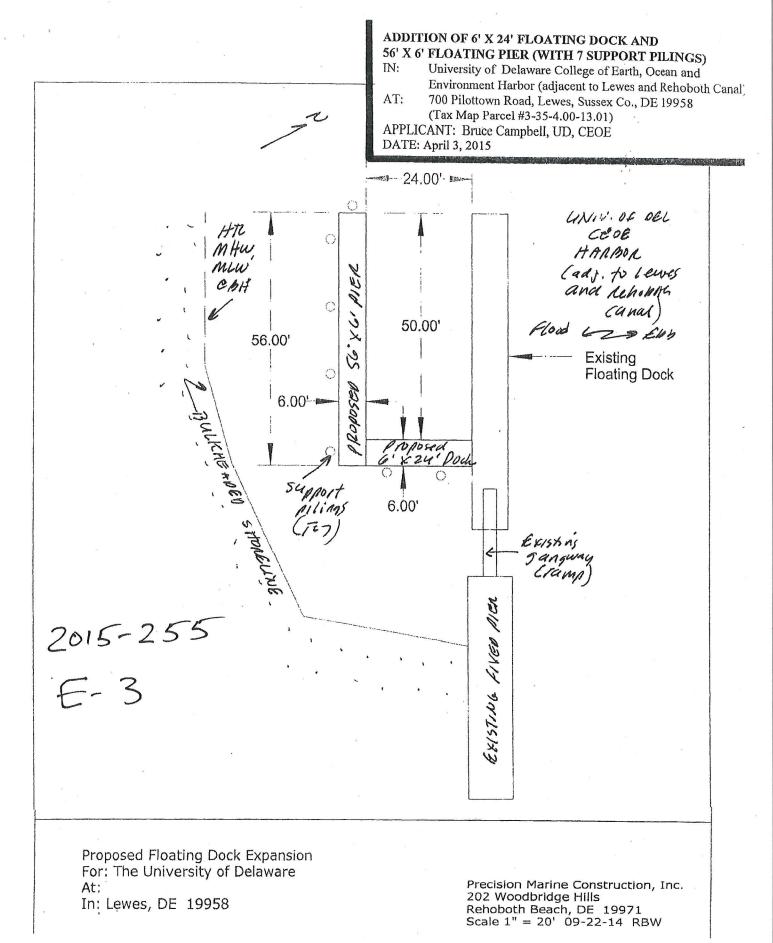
Plan view of existing structure and proposed addition, 6' x 24' floating dock and 56' x 6' floating pier with seven (7) support pilings. Plans prepared by Rob Whitford, Precision Marine Construction, Inc.
